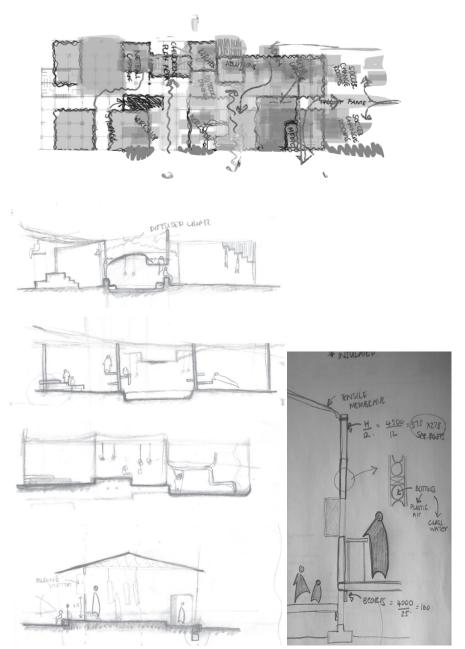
a-f: Iteration 03 - sketches in plan & section (Author 2022)
